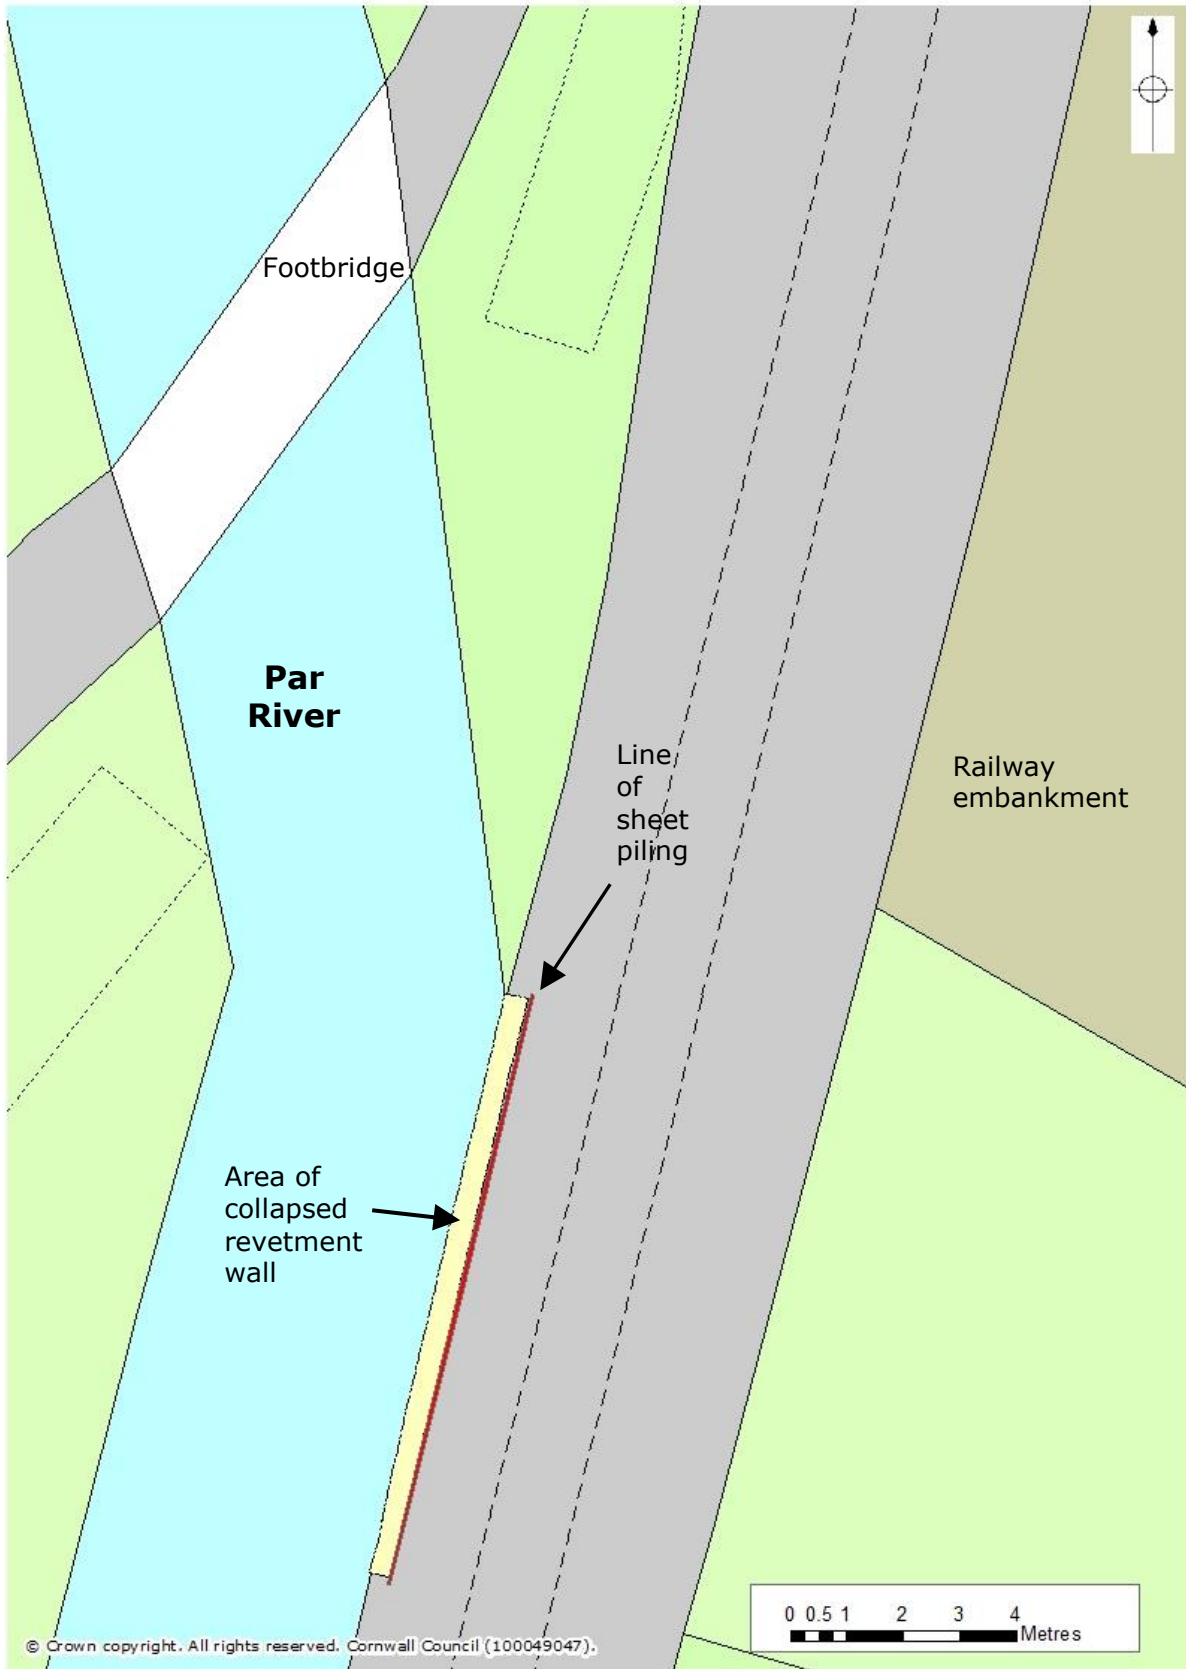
Site Plan, showing the area of the collapsed revetment wall.
